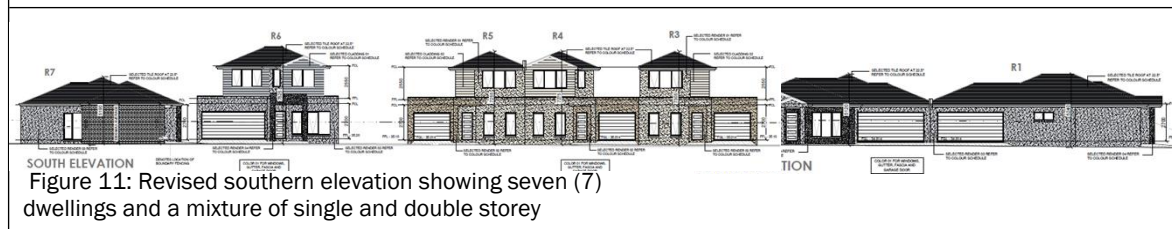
Revised southern elevation showing seven (7) dwellings and a mixture of single and double storey
